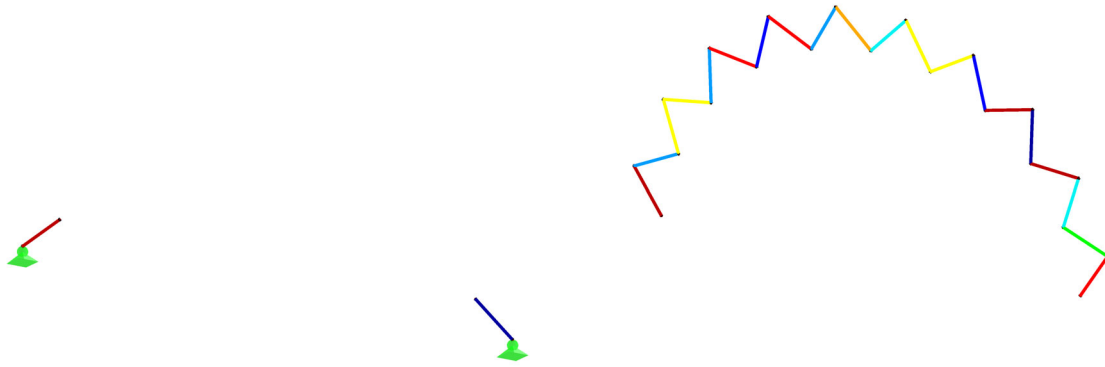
Truss / Supporting members (left) and connecting members A (right)
